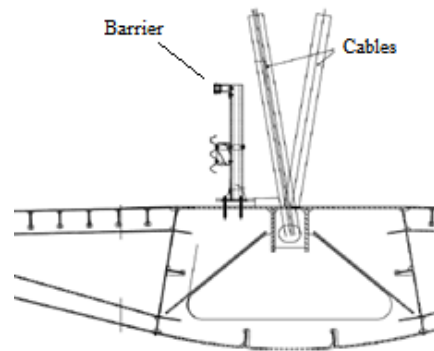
Possible interaction between safety barrier and structural cables on a bridge [9].
